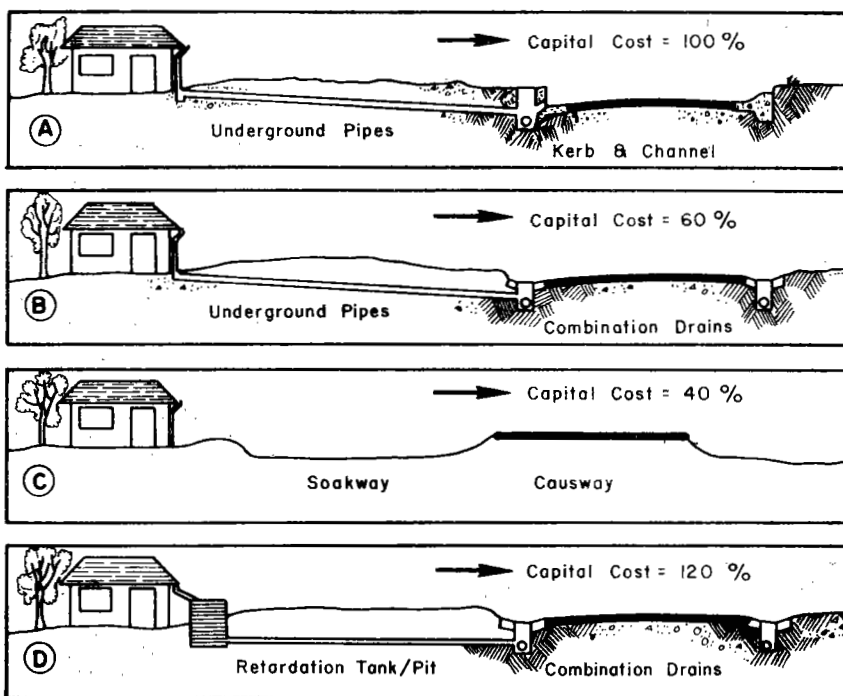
ALTERNATIVE HOUSE/STREETWORK SYSTEMS
